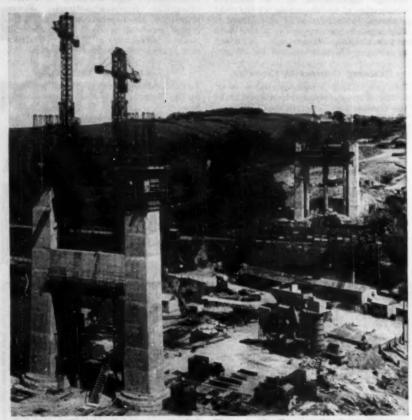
Arrangement of the Plant on the Eastern Bank.
